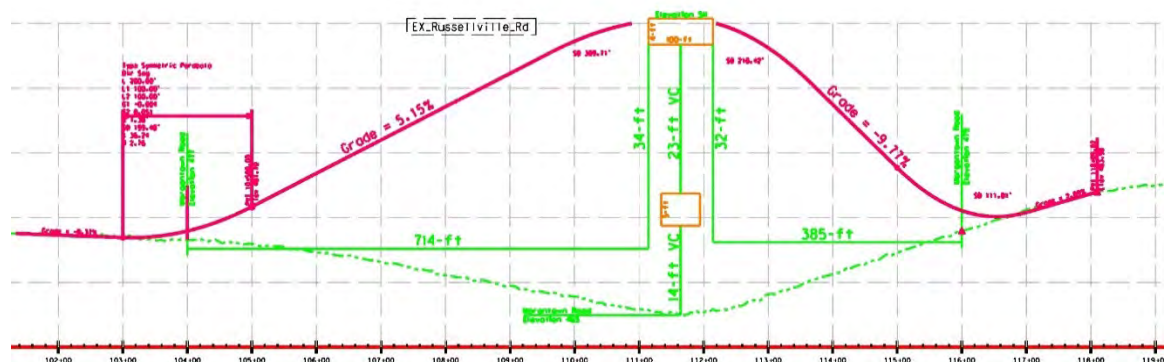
Grades to Construct a New Bridge Over the Existing CSX Bridge and Tie Back Down to University Boulevard (left) and Morgantown Road (right)
